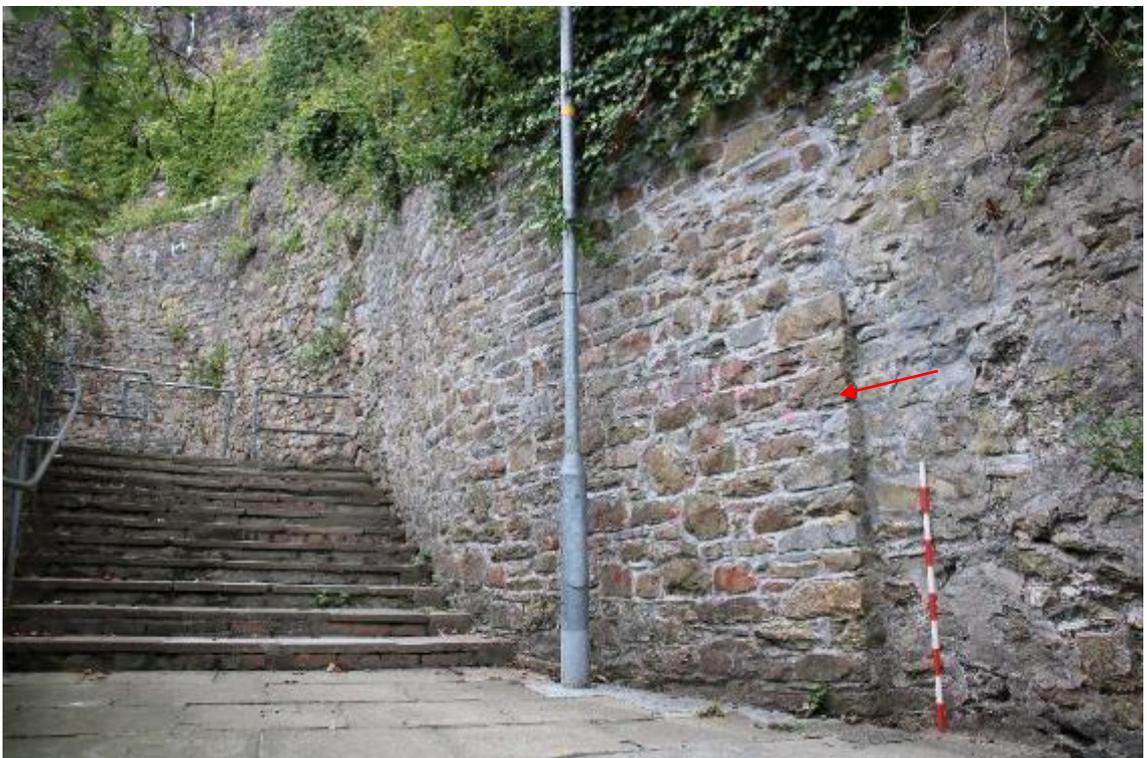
Probable SE corner of building B (arrowed) in Castleback wall
